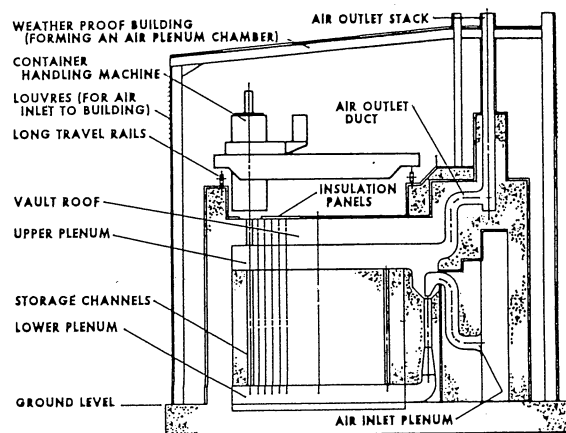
SPENT FUEL STORAGE VAULT - CROSS SECTION.
